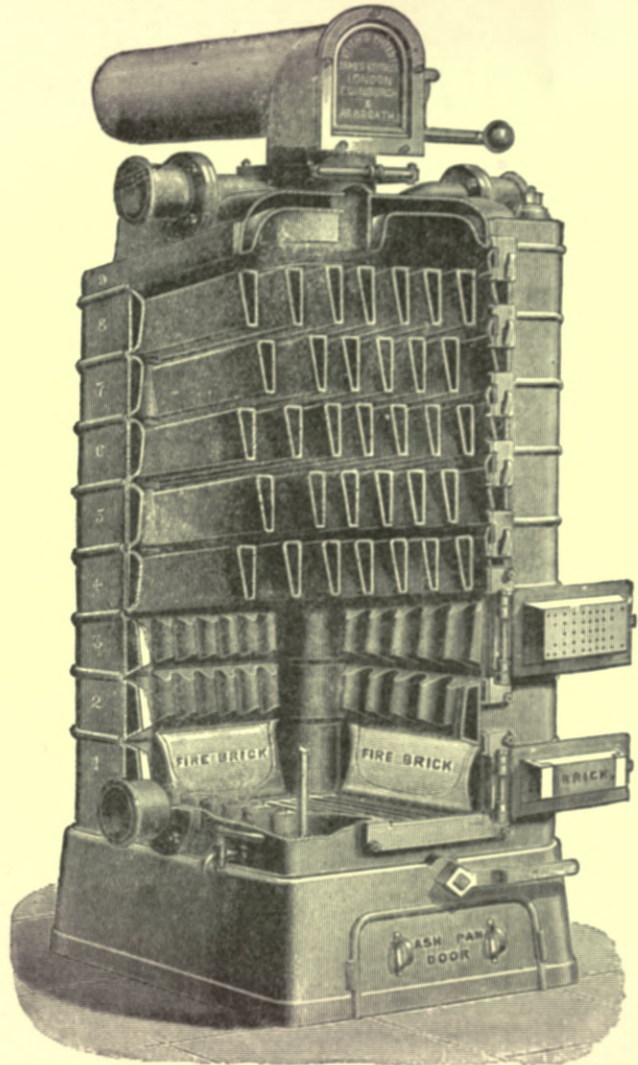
Sectional View of the "Challenge" Cast-iron Boiler.
